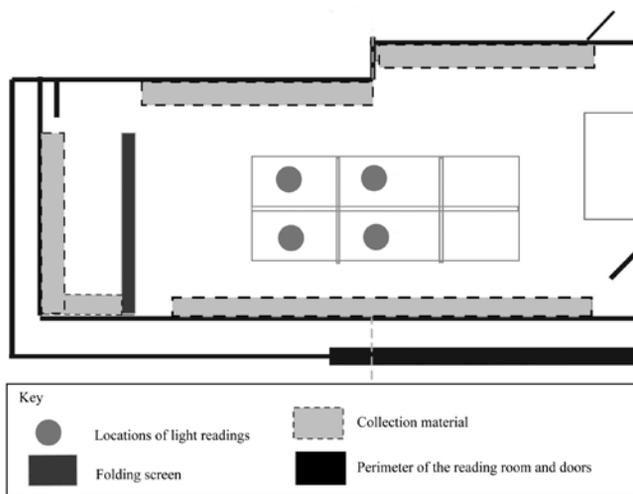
Ahmanson Murphy Reading Room Floor Plan Showing Locations of Light Readings
